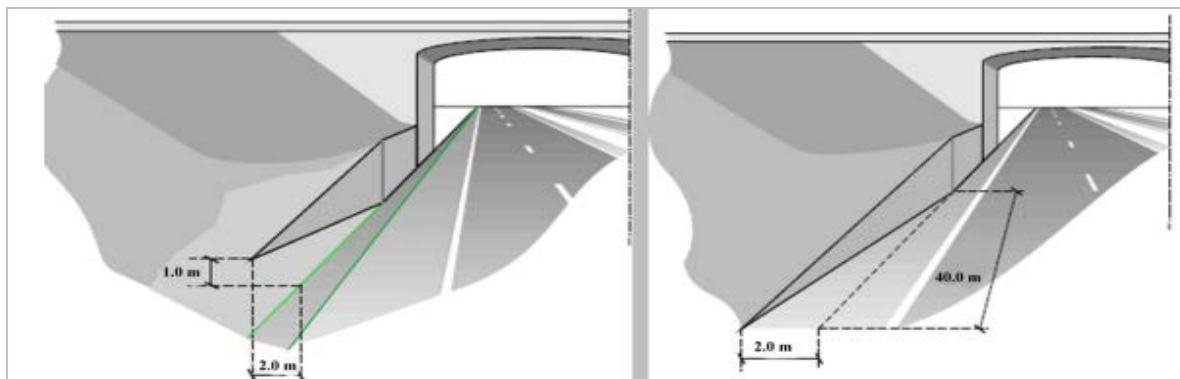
Example of end design of a retaining wall close to the carriageway [B.16]
